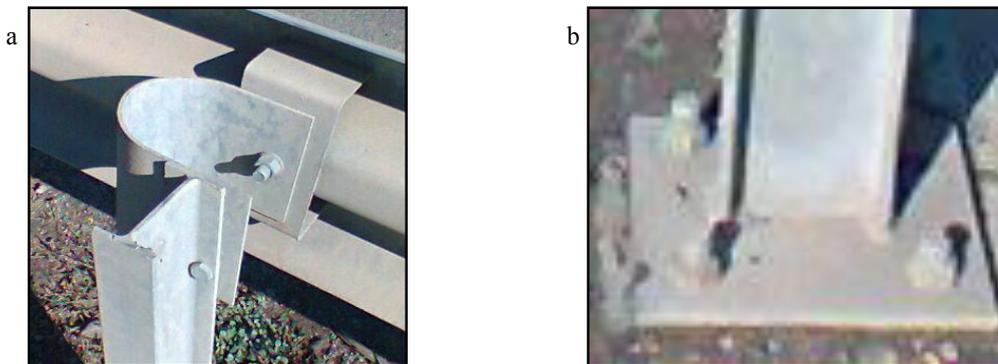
(a) actual safety guardrail; (b) fixing system of the guardrail.
